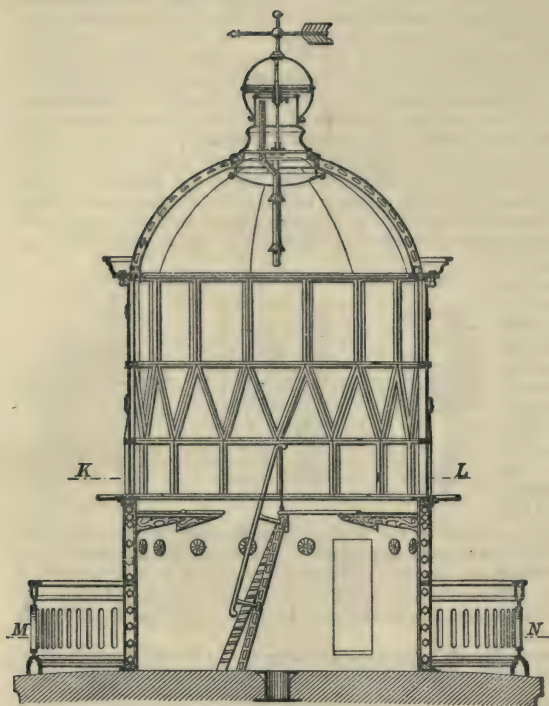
to 5098 are an elevation and plan through the glass, and a half sectional plan through the blocking, of an arrangement of lantern designed by D. M. Henderson to remedy the defects of previous lanterns.
